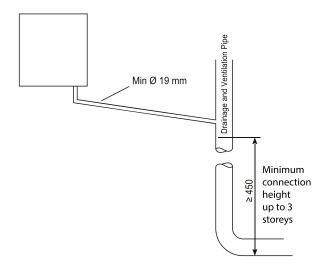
Connection of the Condensate Water Drainage Pipe to Internal Drainage and Ventilation Pipe
